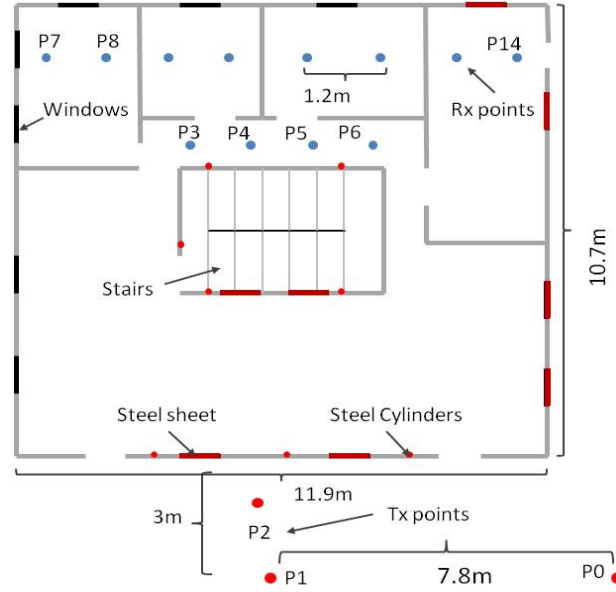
Measurement Scenario 1: 2nd floor layout of wooden building, with steel sheets and cylinders introduced as shown
